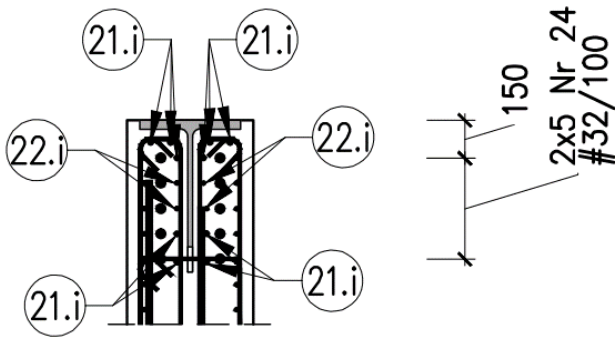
Reinforcing bars in the upper part of the web girders above the pillar [57].
